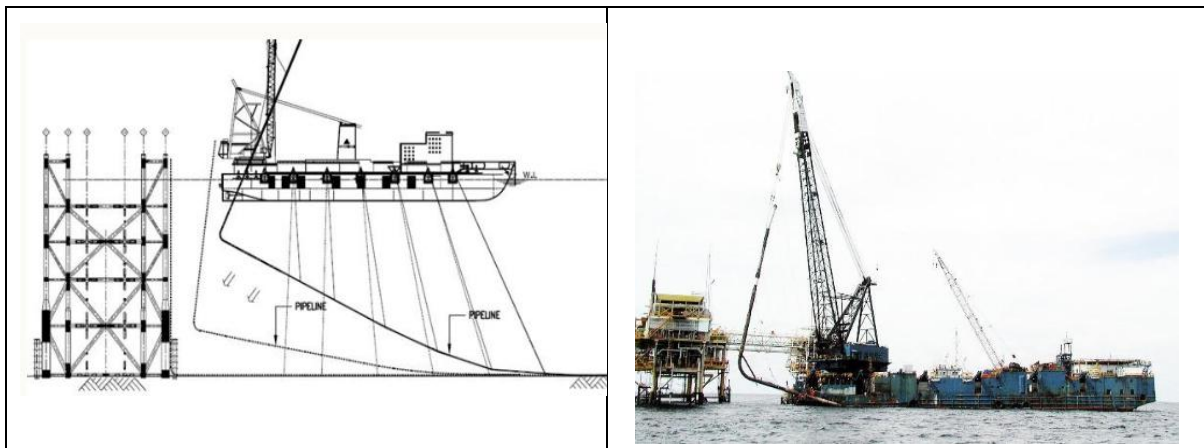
Installation of Riser on Beta Platform, Tie-In Works
